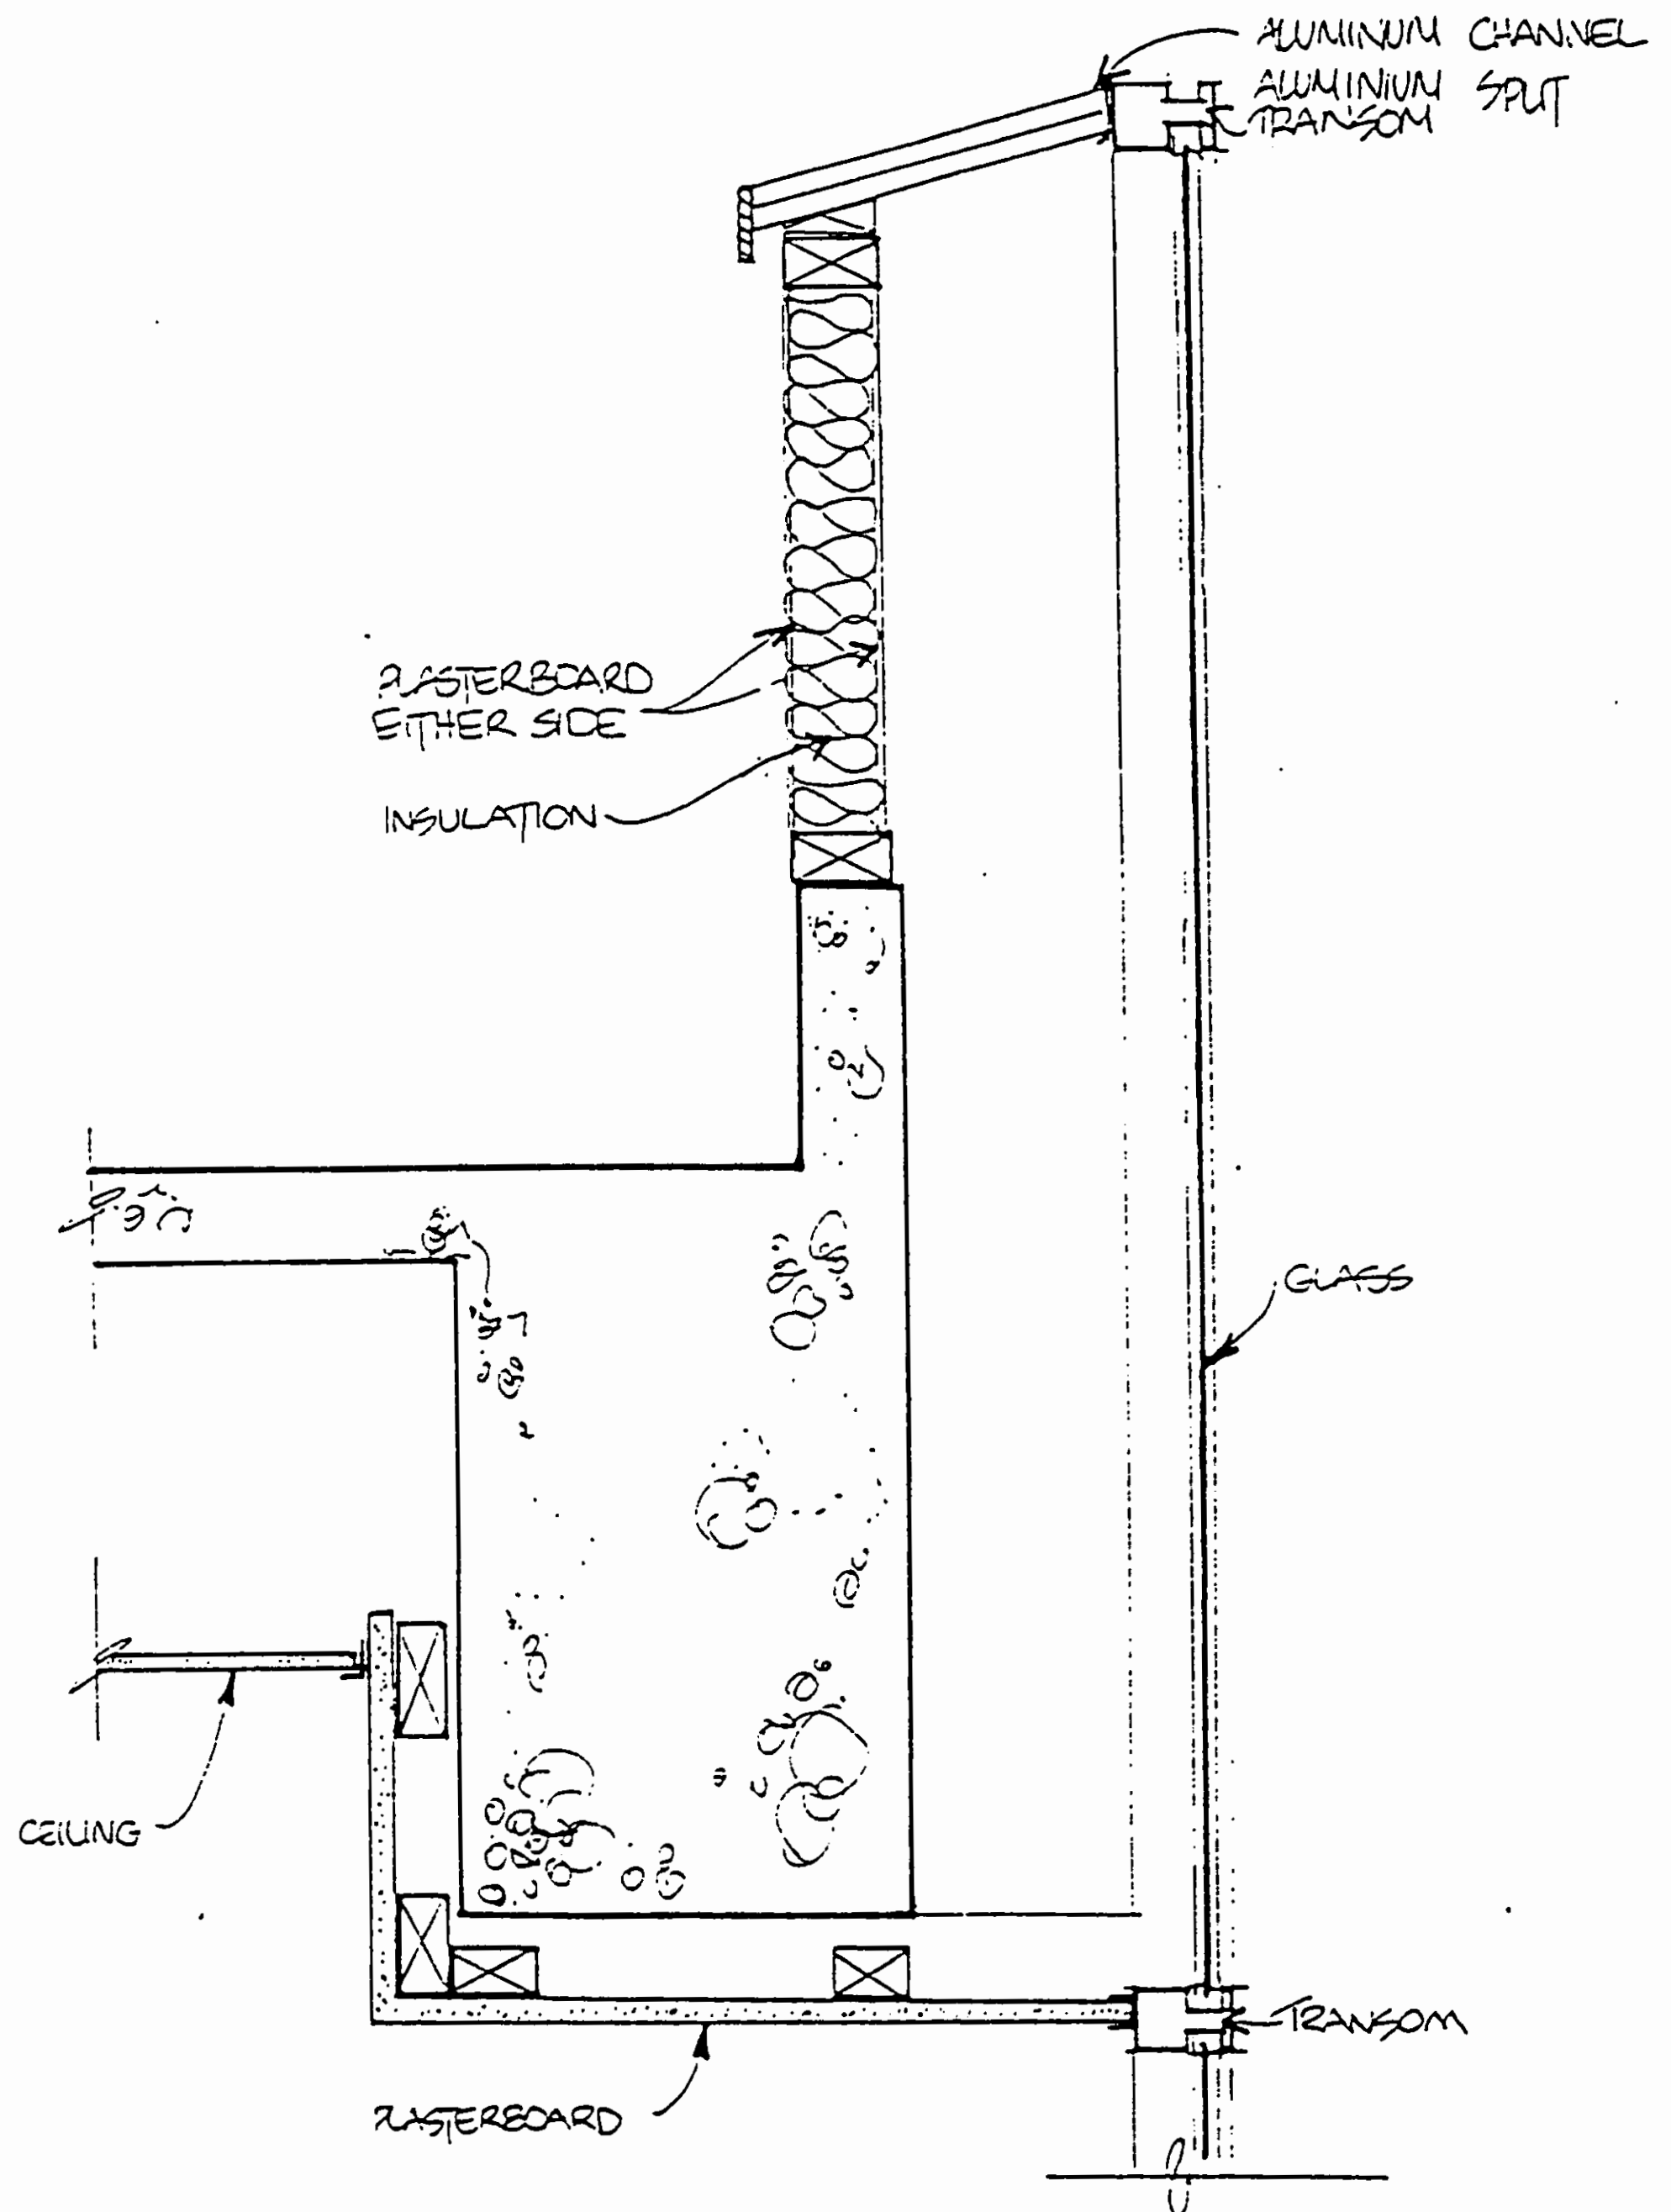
(a): SECTION THROUGH CONCRETE FRAMED
